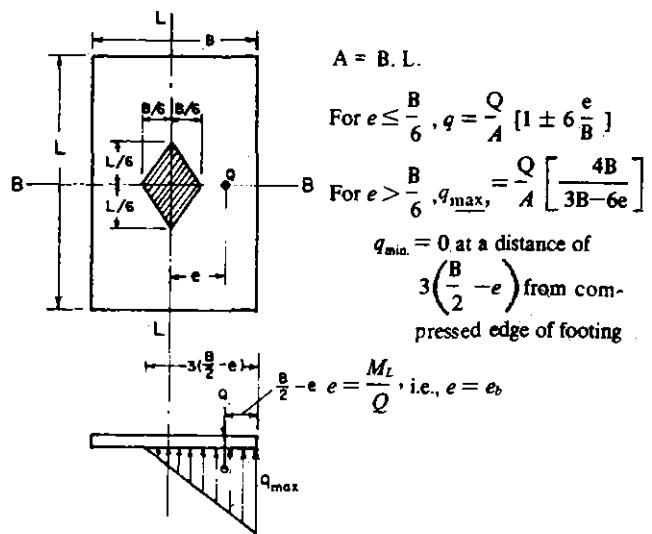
Rectangular footing, load on one of the center lines of footing
